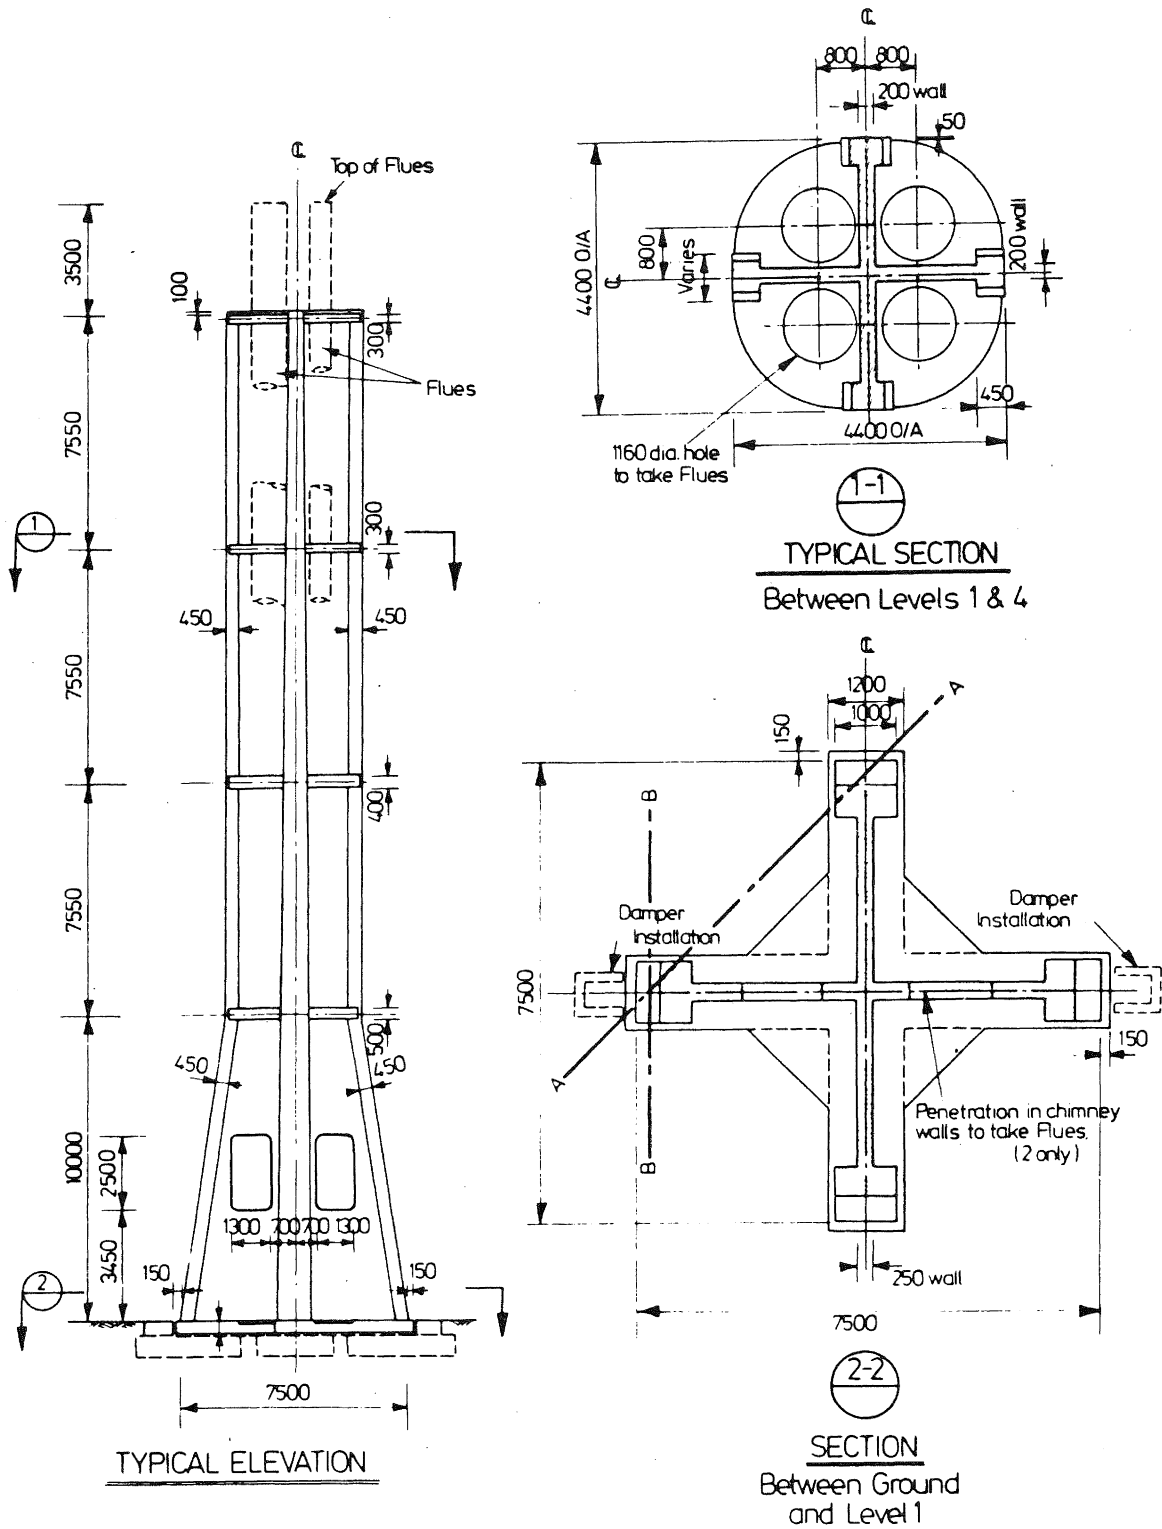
CHIMNEY SUPERSTRUCTURE LAYOUT
